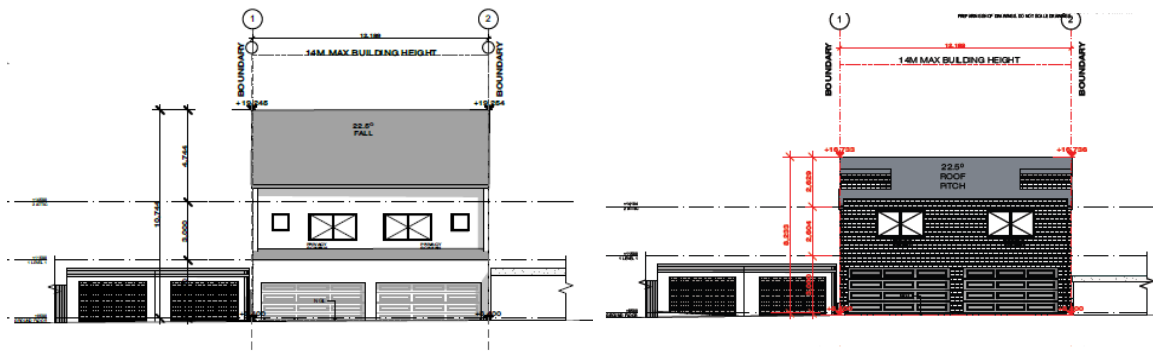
Original Proposed (L) and Amended (R) Southern Elevation Rev E
